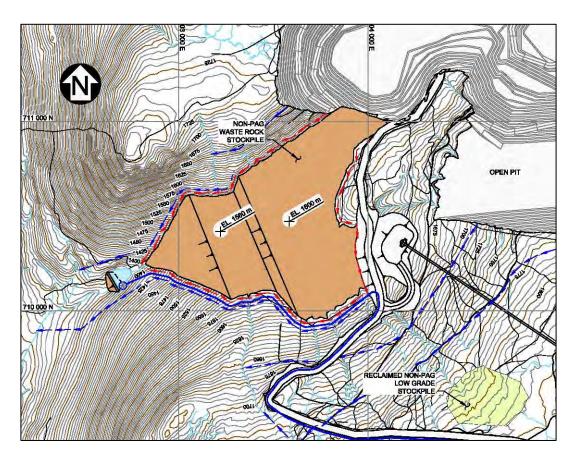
Non-PAG Waste Rock Stockpile WMP
